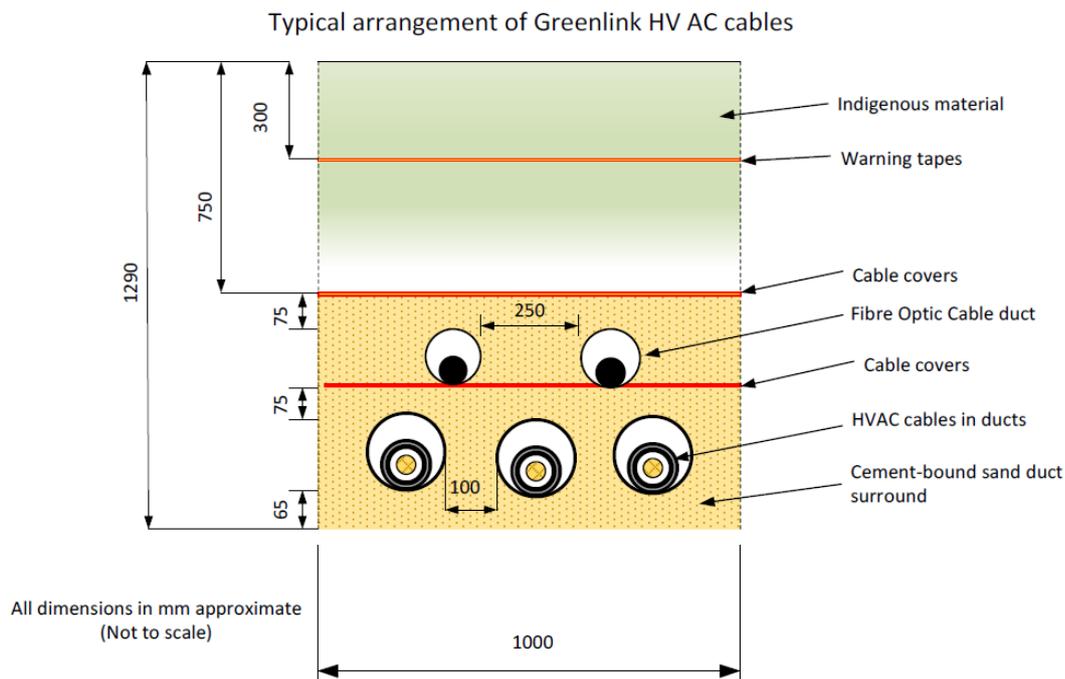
Typical HVAC Trench Cross-Section (source: WSP | not to scale)
